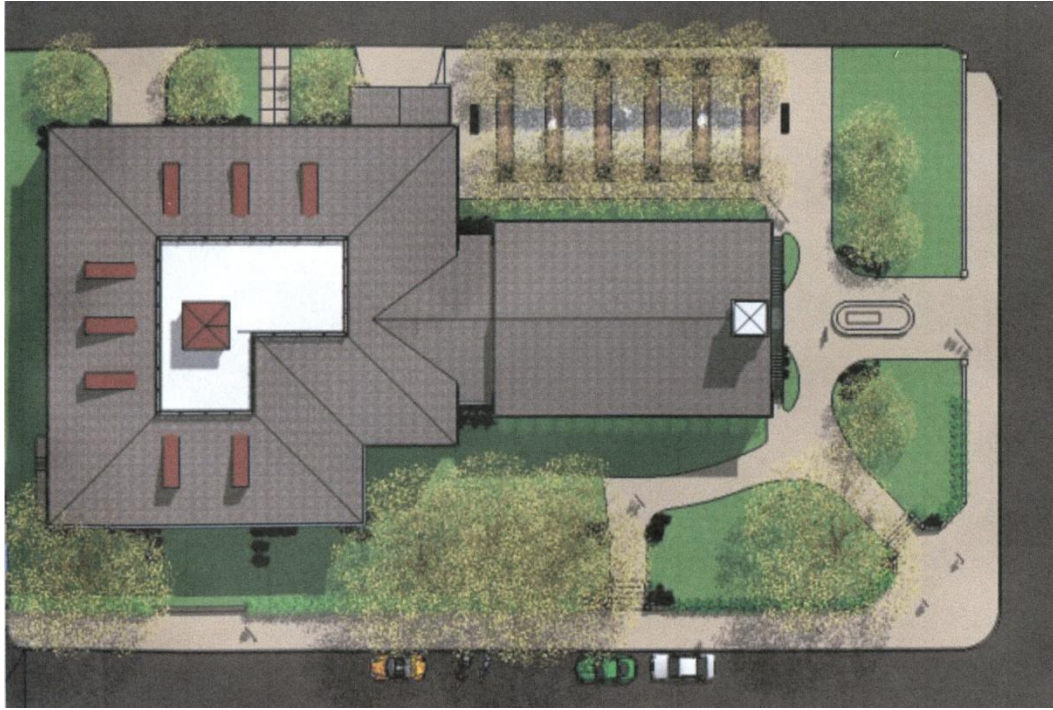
Site plan for proposed Courthouse expansion. Source: ADS 2012 study
